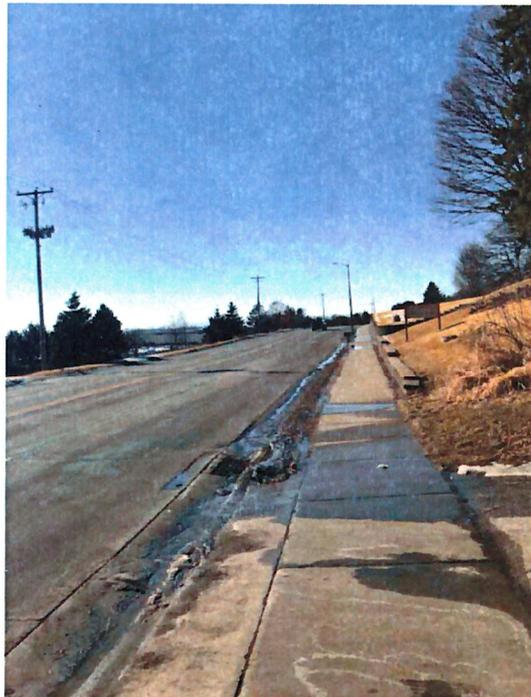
Looking West along Main Street, from Spot Speed Location (Site 2)
